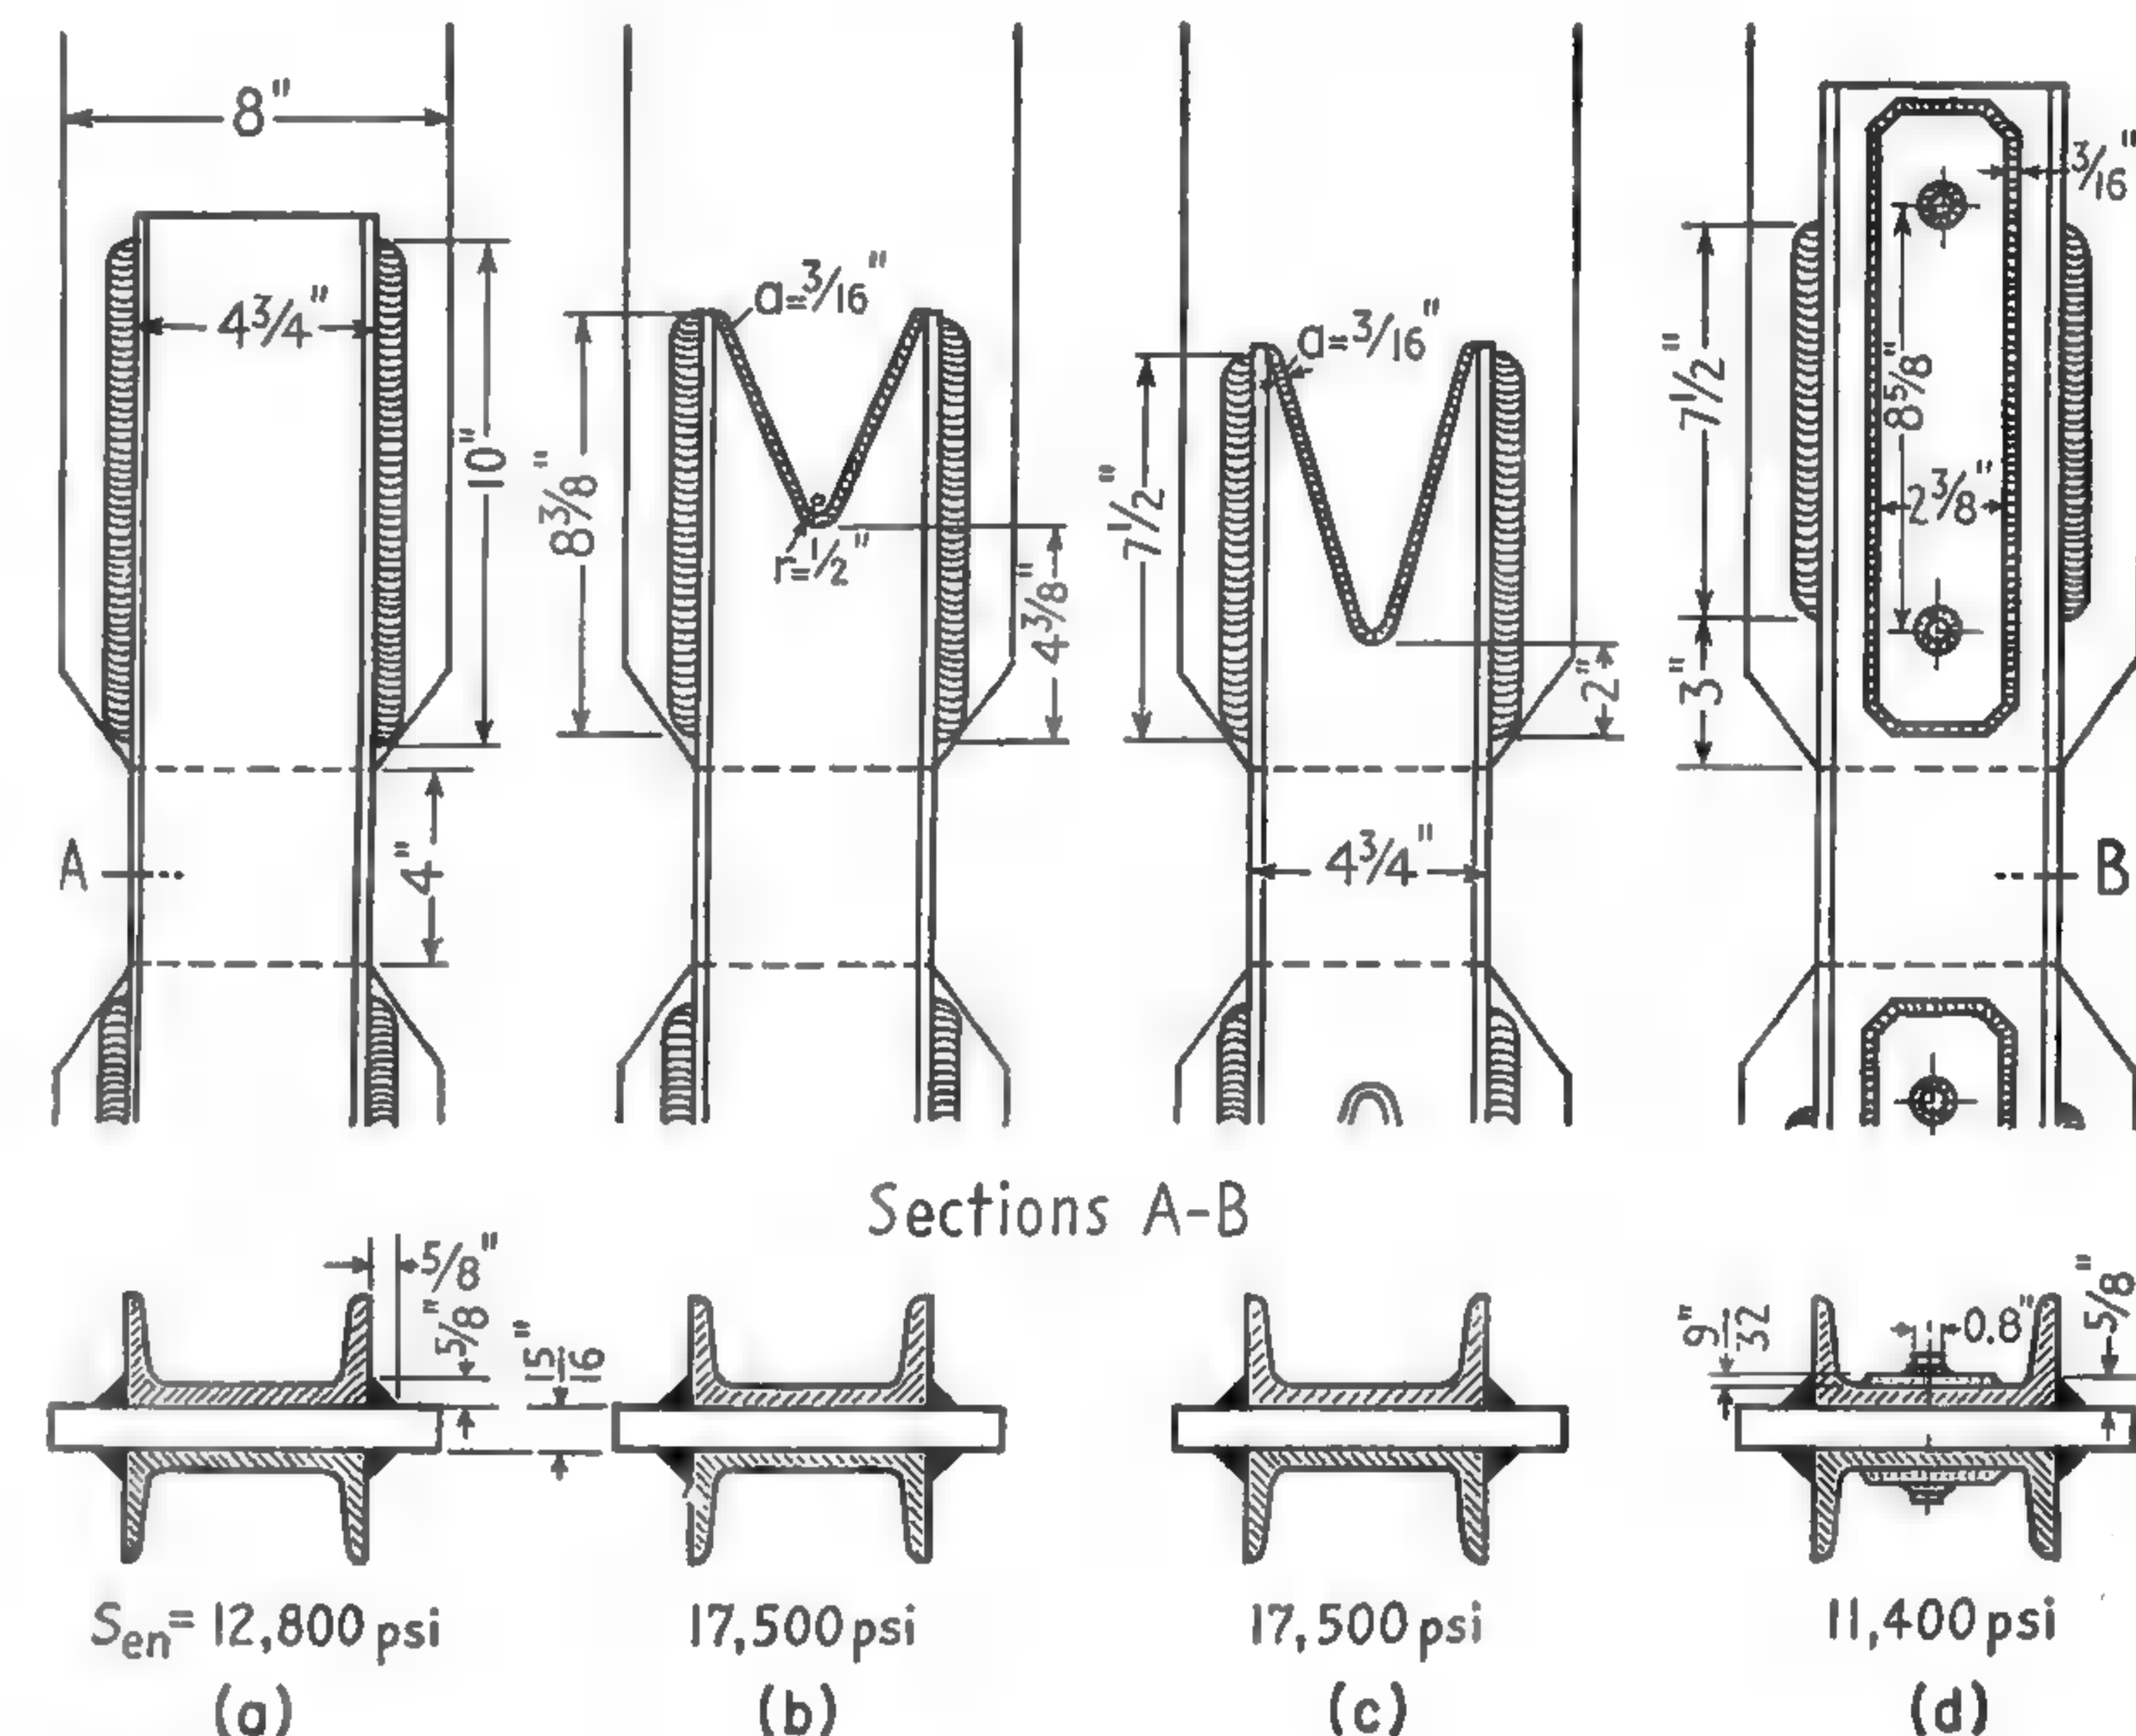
Endurance of class 1 welds connecting channels to a plate.
